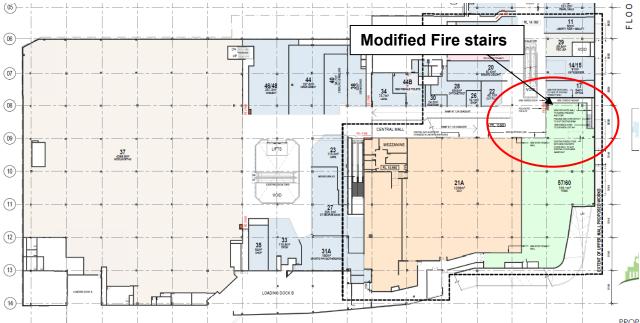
Modified upper mall level layout approved under M/2018/165 at 122-138 Flood Street.
